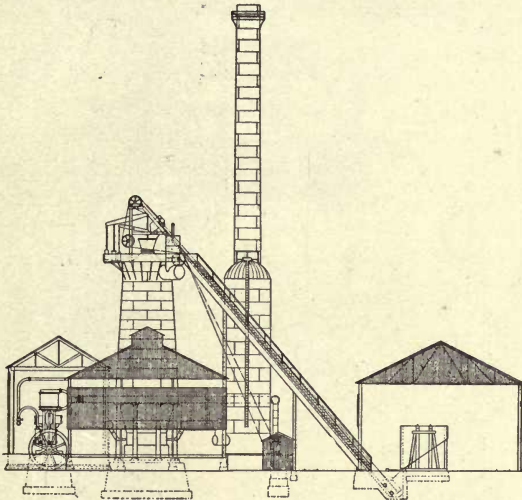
HOISTING APPARATUS OF A MODERN FURNACE—LABOR ALL ACCOMPLISHED BY MACHINERY.
